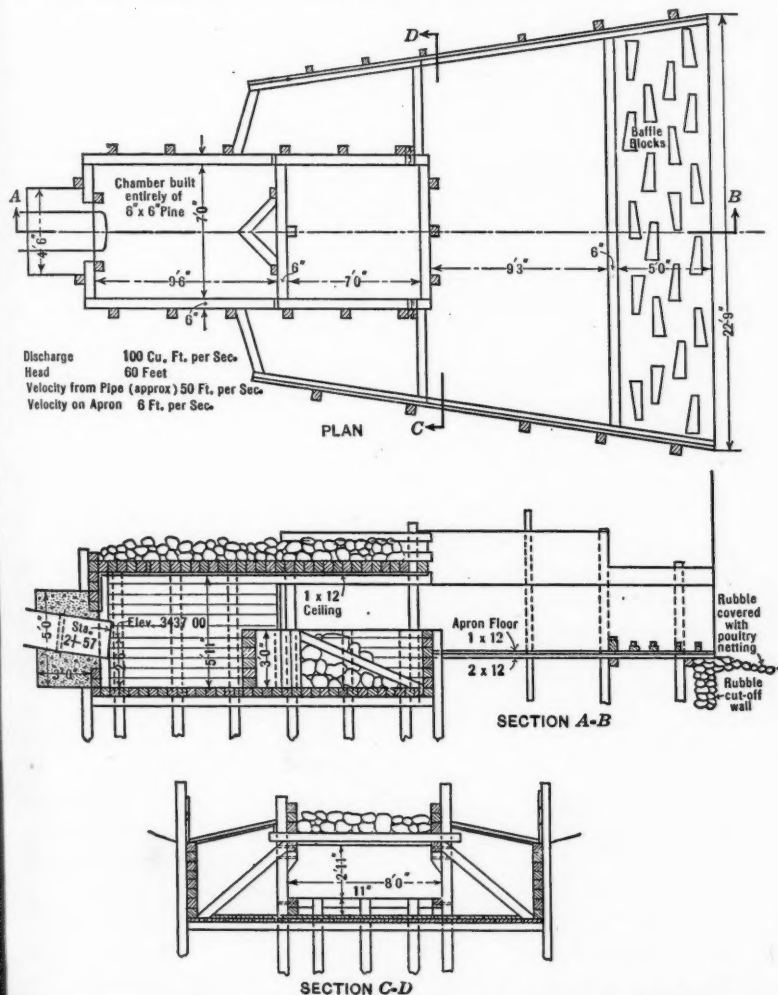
PLAN AND SECTIONS, ENERGY DISSIPATING CHAMBER, BROWN'S CREEK DITCH.
